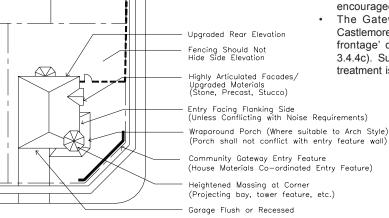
Conceptual plan view of Gateway Dwelling
